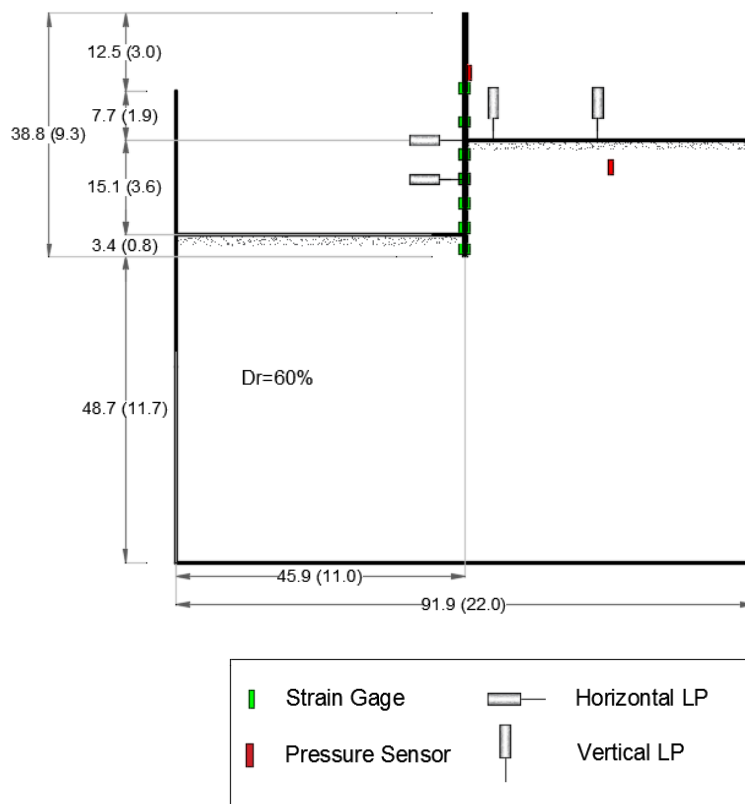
Cross section of the centrifuge model before sheet pile wall driving); the dimensions are provided in prototype-scale in feet (and in model-scale in inches).
